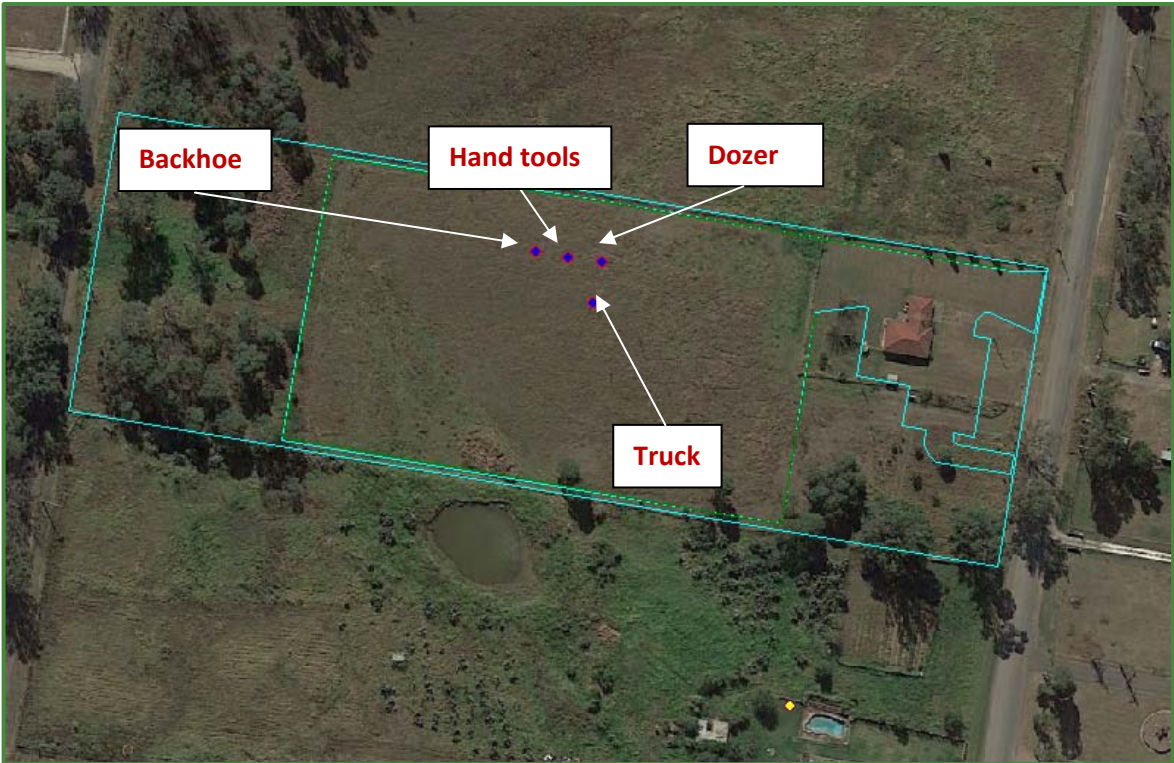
Construction Stage 2 – Concreting Construction Works
